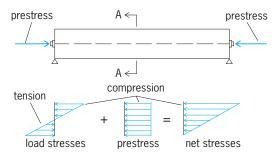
Diagram showing stresses at section A-A of a concrete beam with uniform prestress.
